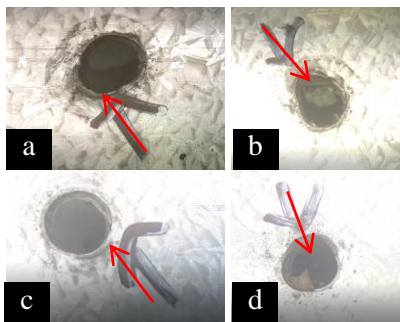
Beam bolt holes failure mode for HG-BGJ-7
